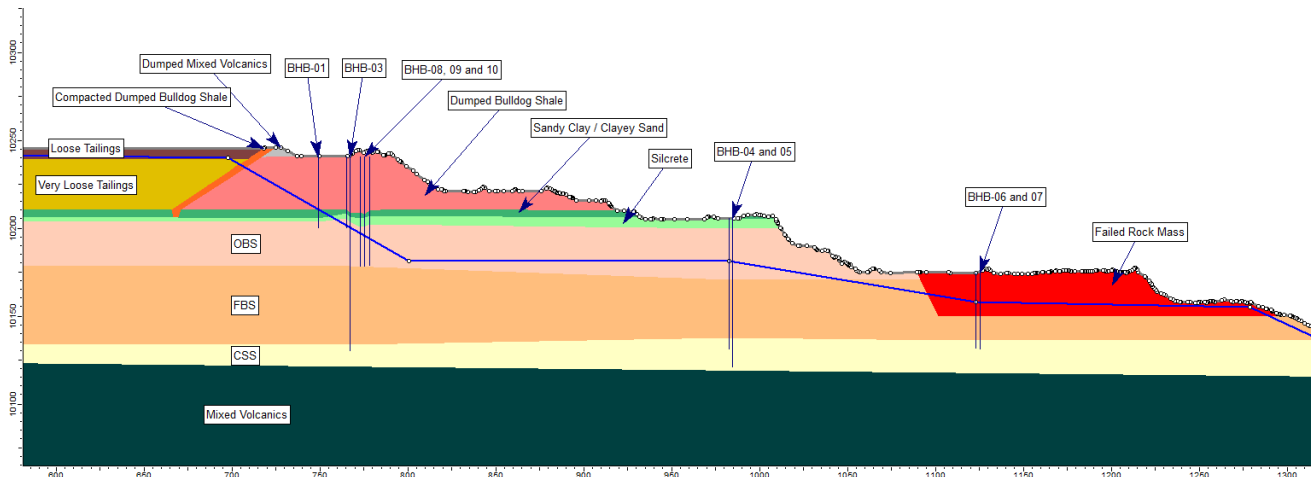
Stage 6 TSF layout at Section B (pit alignment)
